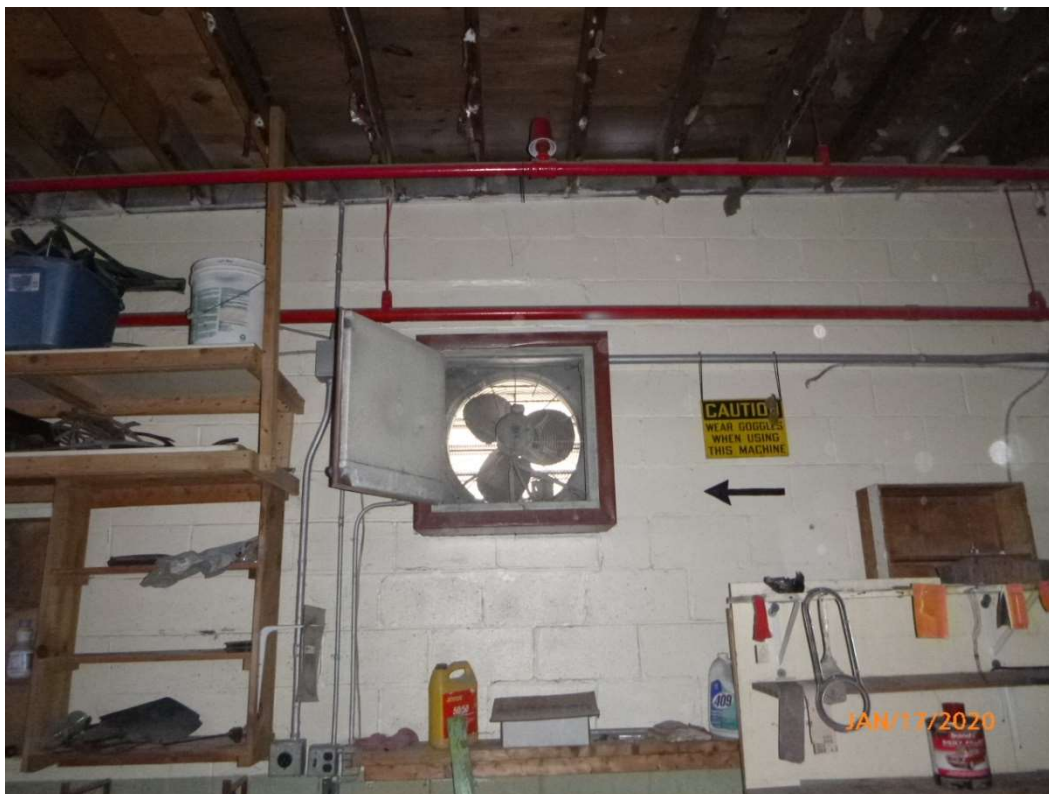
Exhaust fan for the shop, located along the east wall of the building.
